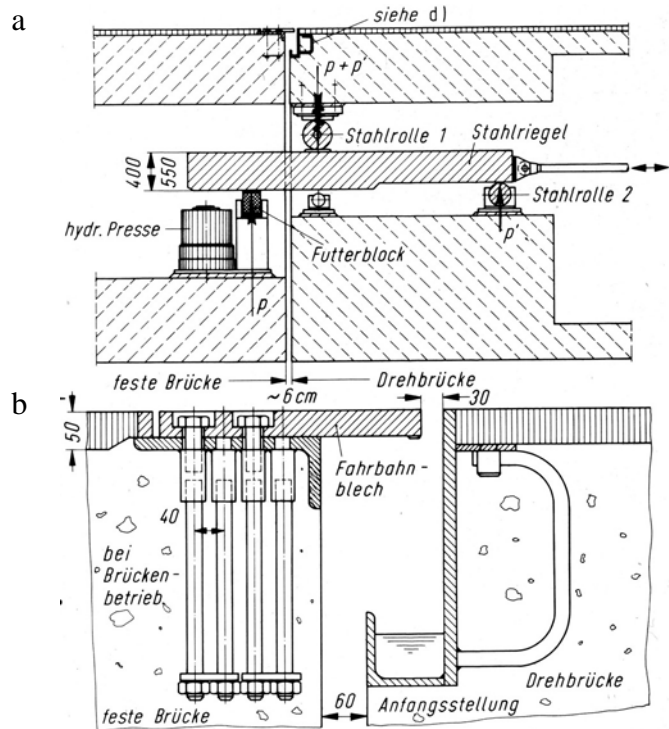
Joint to the fixed part: a) Locking device, b) expansion joint
